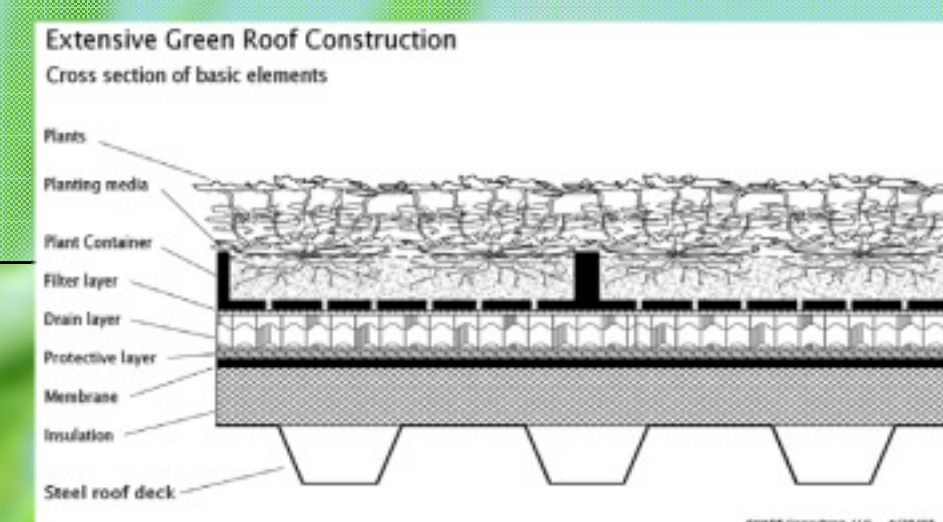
A detailed diagram illustrating the basic construction of extensive green roof
